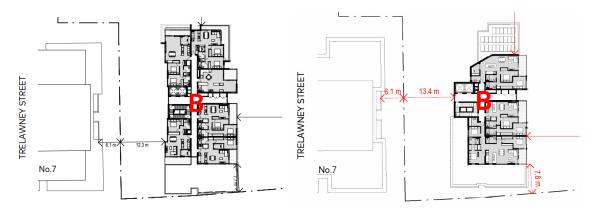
Originally Submitted (Left) and Amended (Right) Level 12 Plan.
